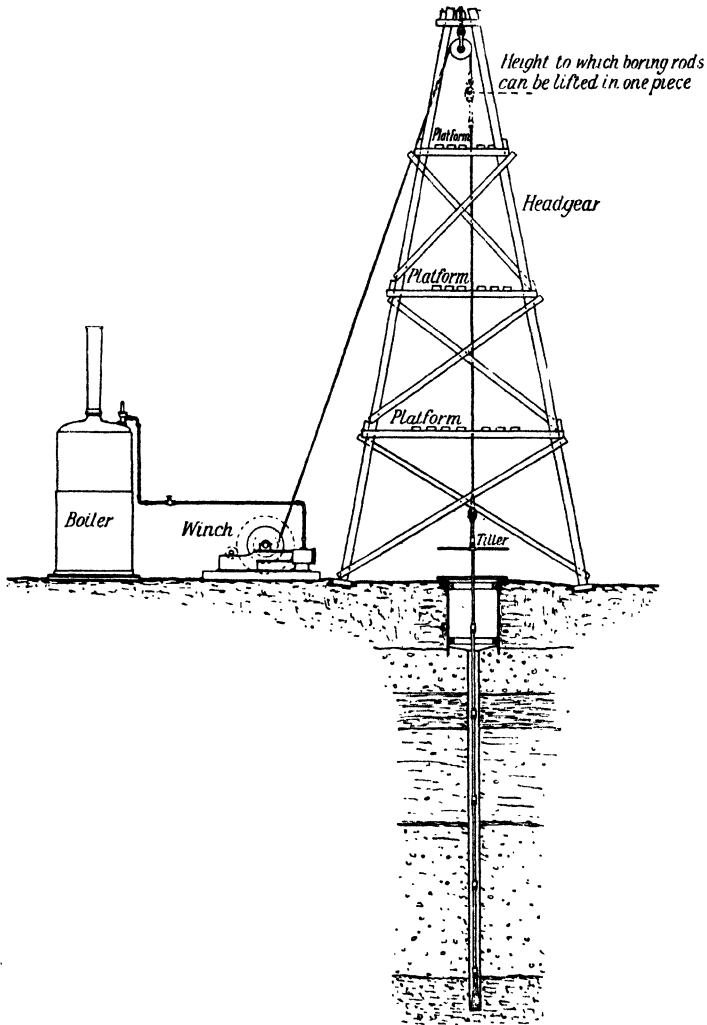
Percussive Boring, Power Plant for Deep Holes, with Trestle Headgear.
